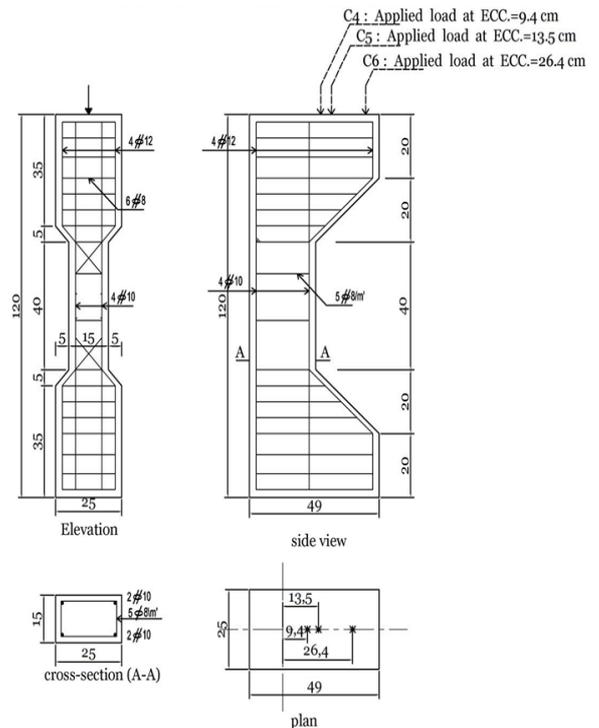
Typical dimension and reinforcement of columns C4, C5, C6
